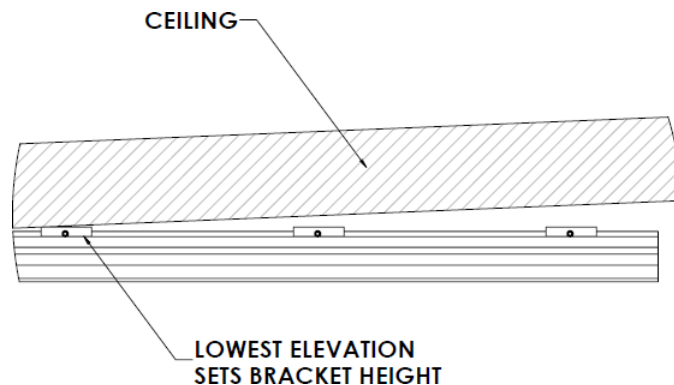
Lowest Elevation Point Where the Ceiling Brackets Will Be Installed
